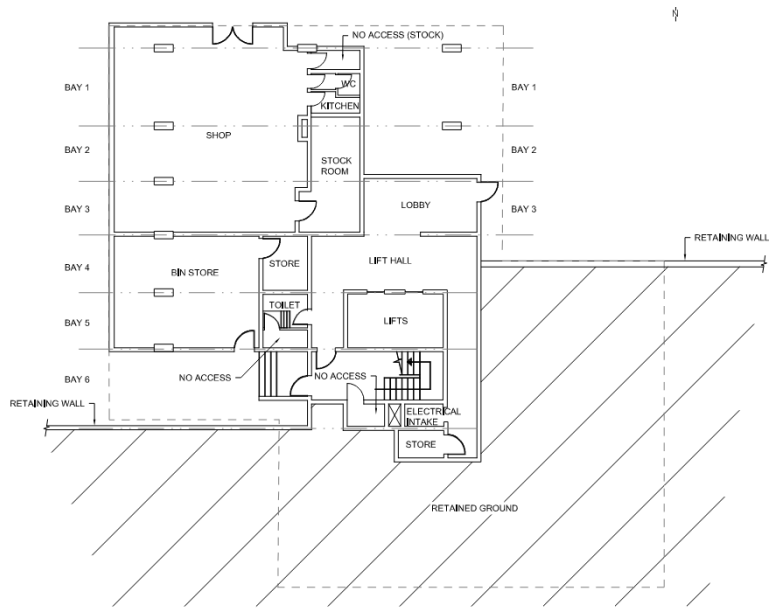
Kestrel Court Ground Floor Layout with Outline of Upper Storey Structure Over
